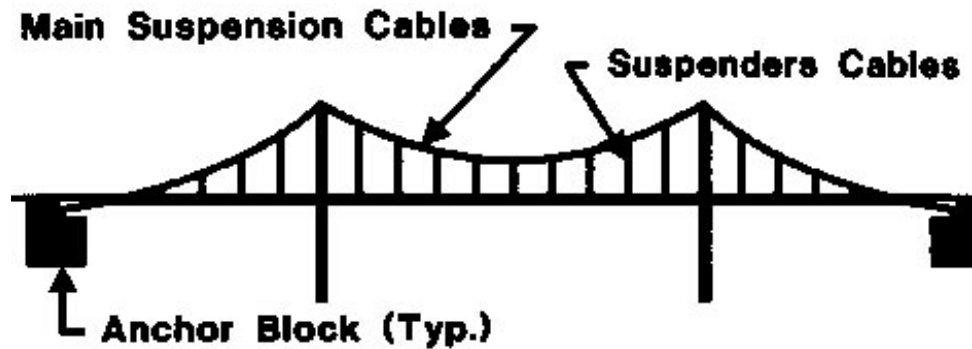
Three-Span Suspension Bridge Schematic
